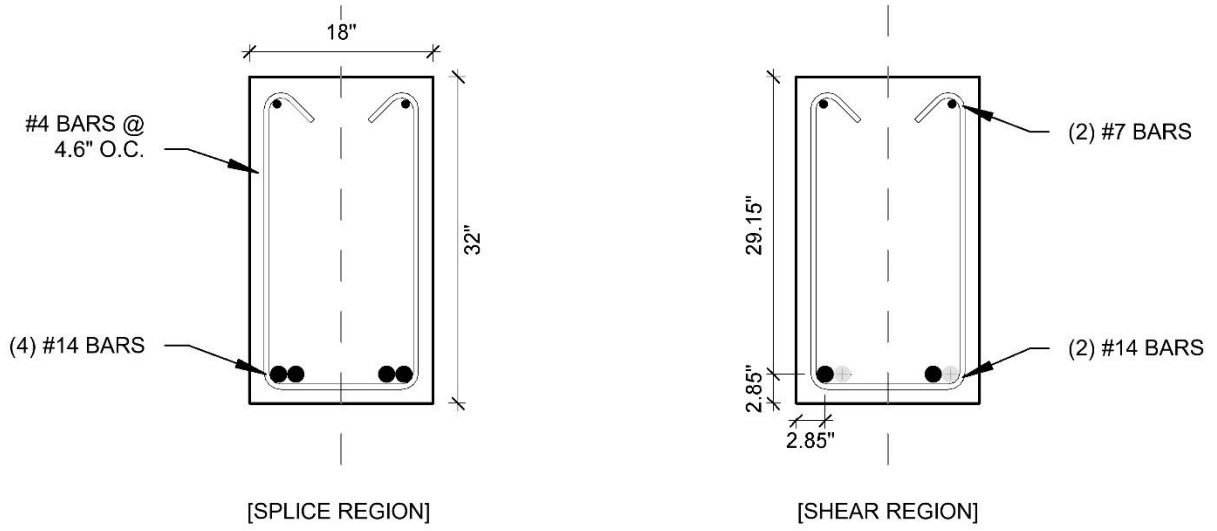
Cross section of 14-e (1 in. = 25.4 mm)
